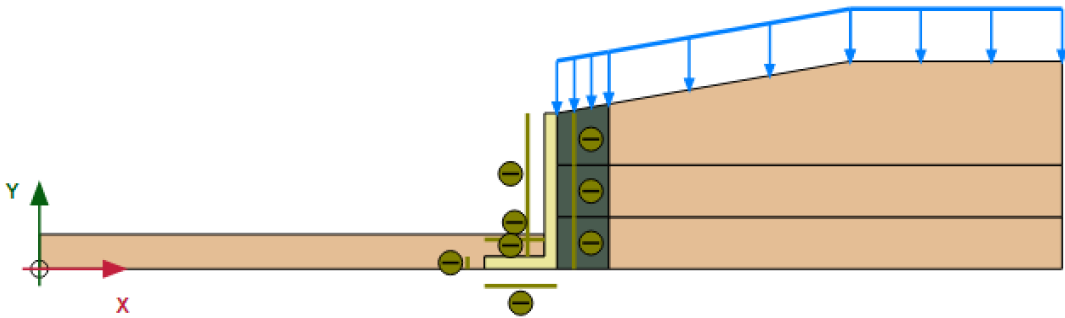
Retaining wall with backfill slope 10° and 1.5m TDA backfill
